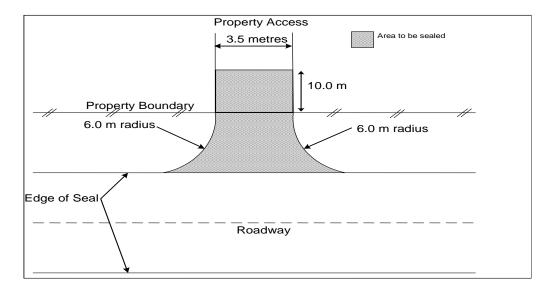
Vehicle Access Crossing and On-Site Access Standard
